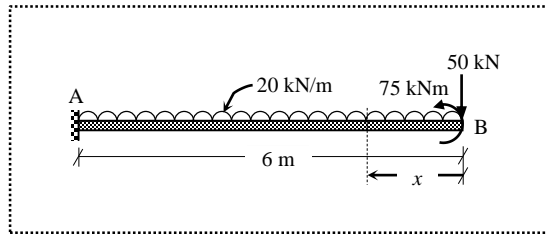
Cantilever beam with multiple loads (Example 2.5)
